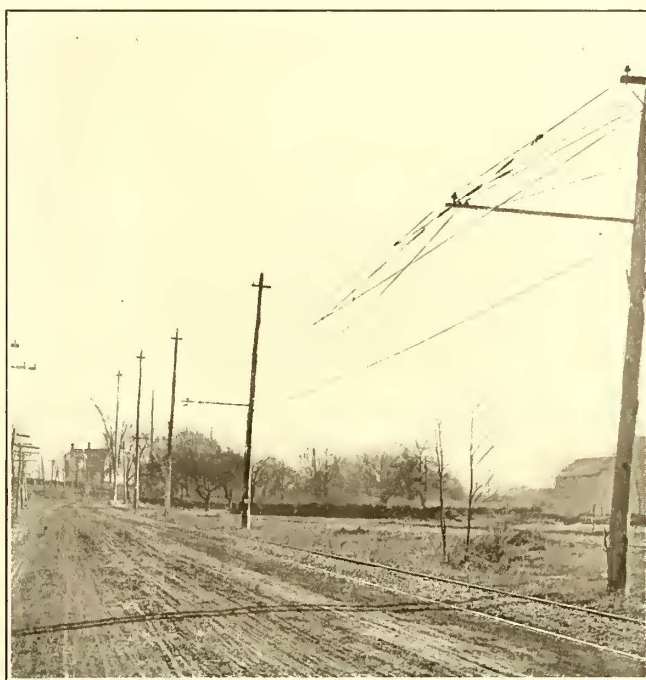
Shore Line Railway—Overhead Construction at an Anchorage
